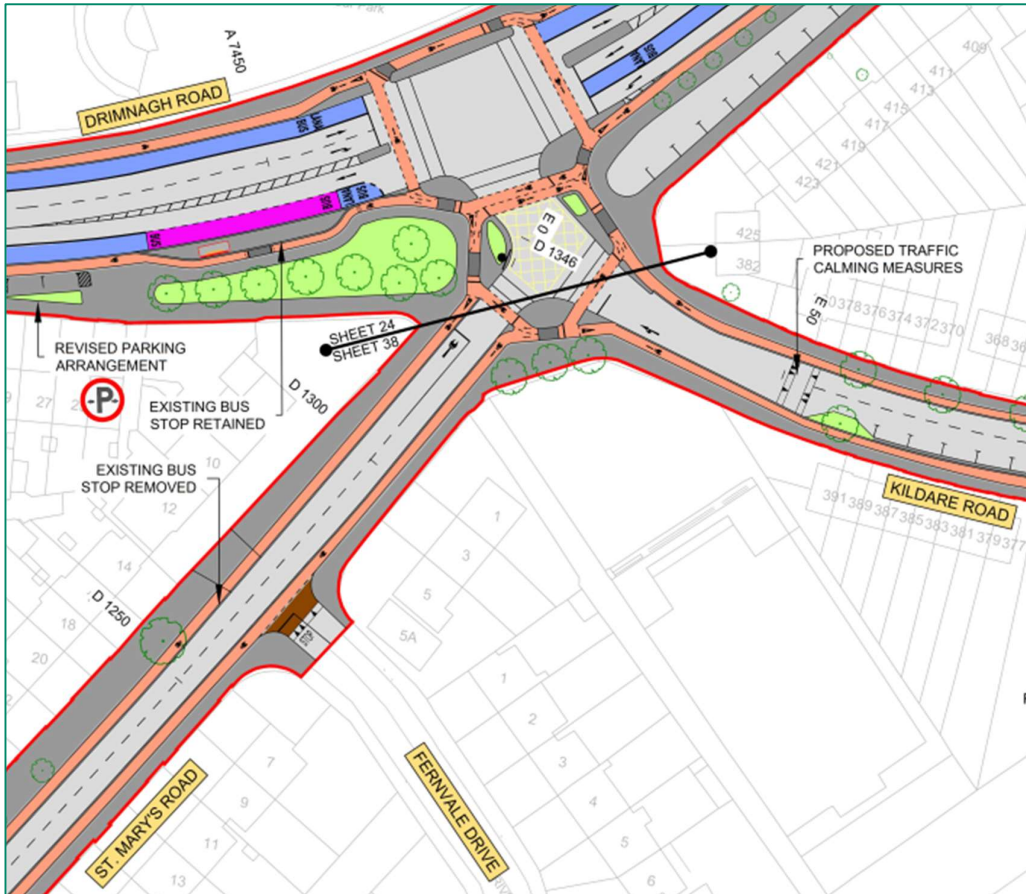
Extract of General Arrangement Drawings at St Marys Road / Drimmagh Road / Kildare Road junction
